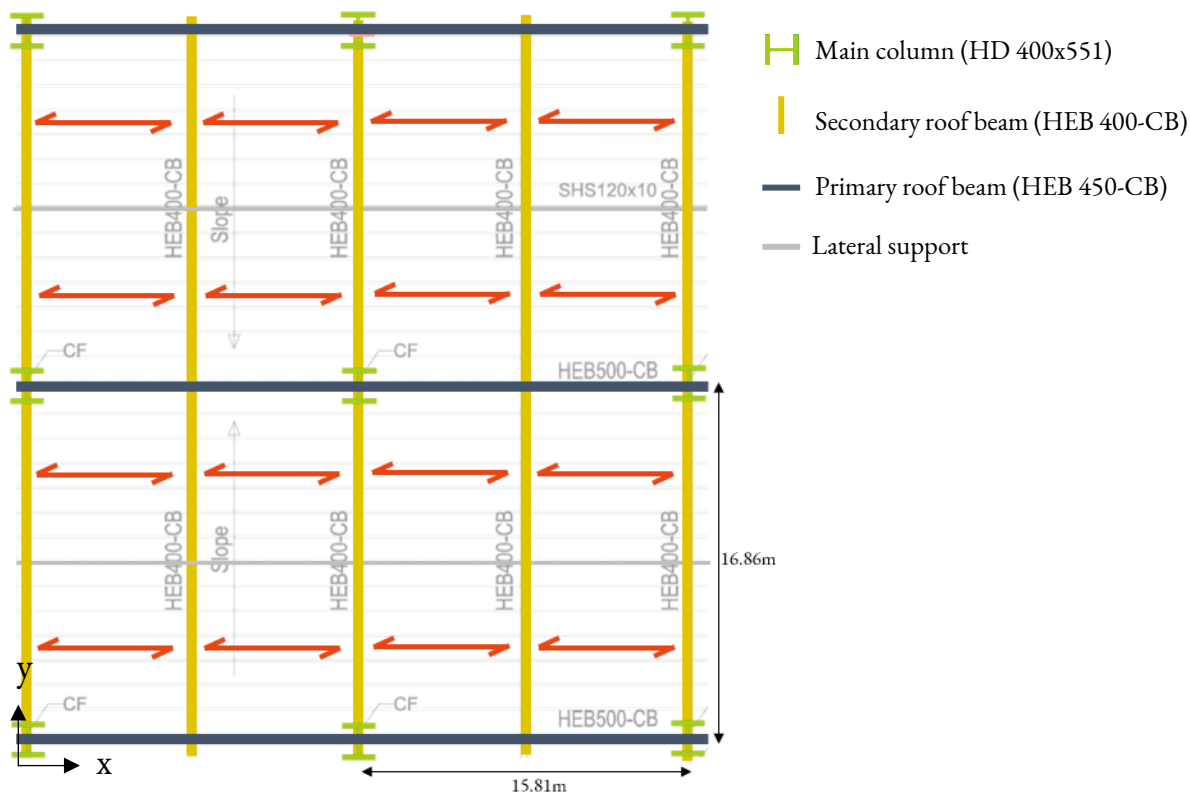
Top view of the roof beams (at zoom in shown in Figure 6-6)
